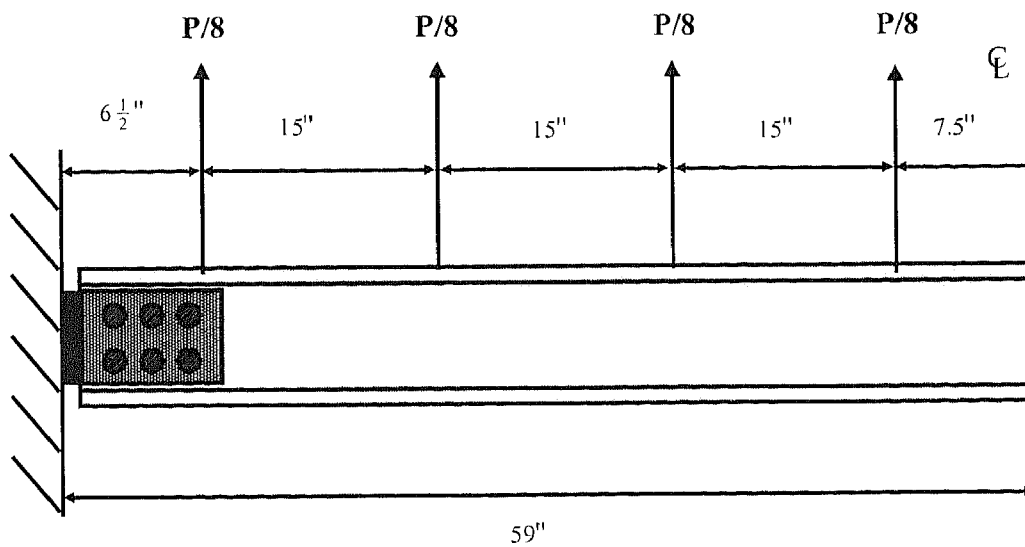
Load Applied to Steel Stud with Steel Angle Connection
